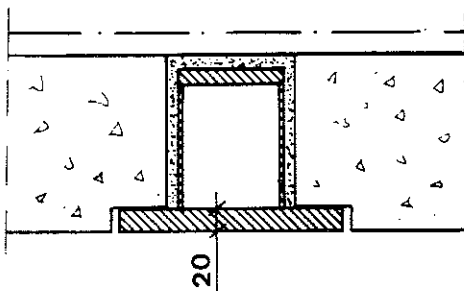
a. Steel floor girder carrying precast concrete floor units on the bottom flange
